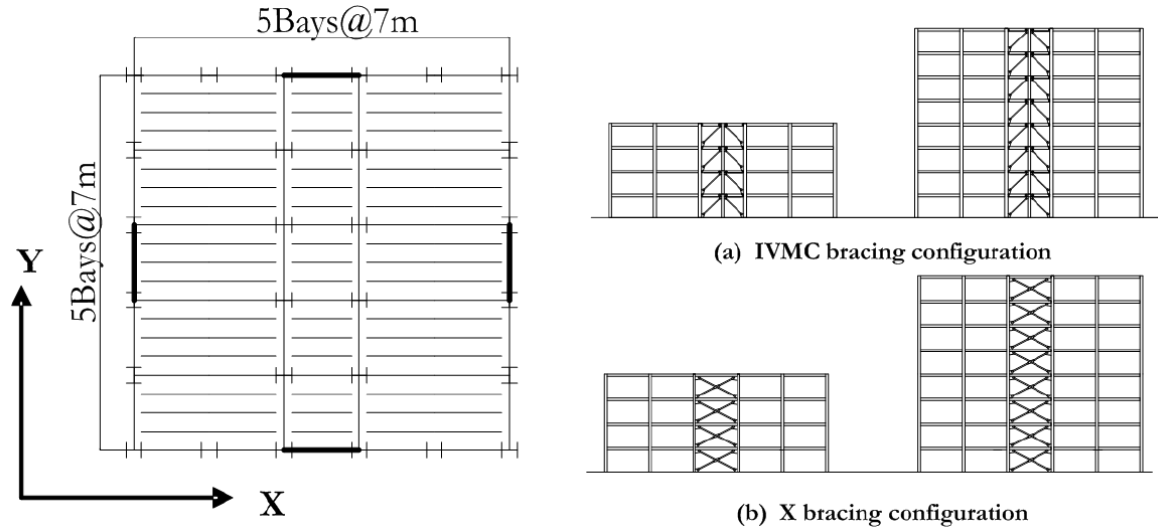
Plan view and elevation of CBF structures with (a) IVMC (b) X bracing configuration
